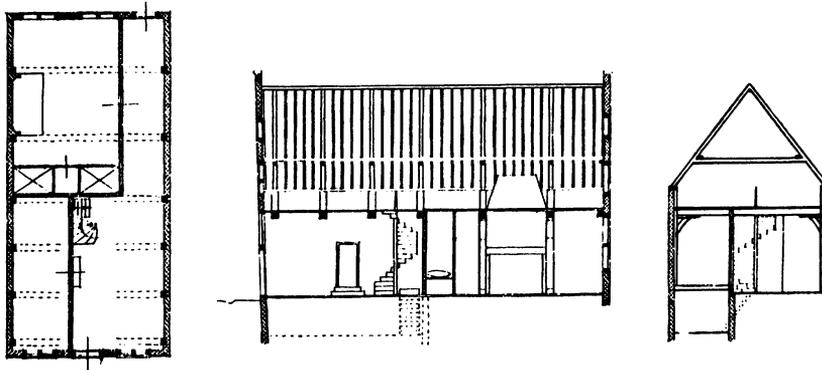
Netherlands house with anchor-bent framing and brick cladding: two rooms wide within the anchor bents. Edam, Spui, ca. 1600. From R. Meischke and Henk Zantkuyl, *Het Nederlandse woonhuis van 1300–1800* (Haarlem: H. D. Tjeenk Willink, 1969).
